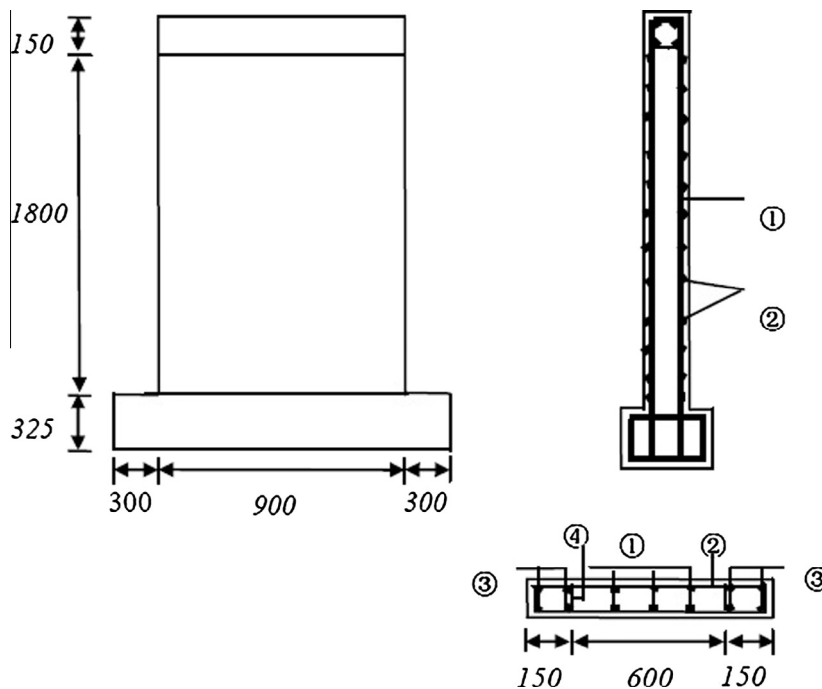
Detailed specimen dimensions and layout of steel bars.
